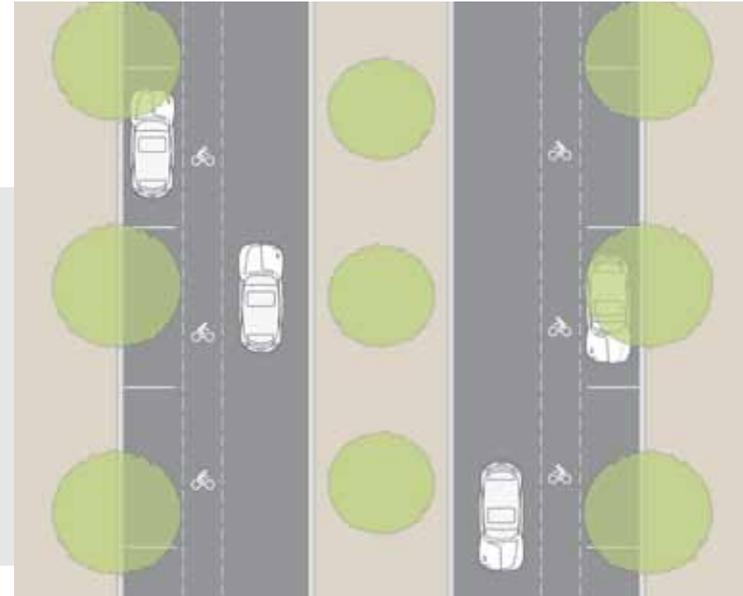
ALTERNATIVE ARTERIAL ROAD CROSS-SECTION
